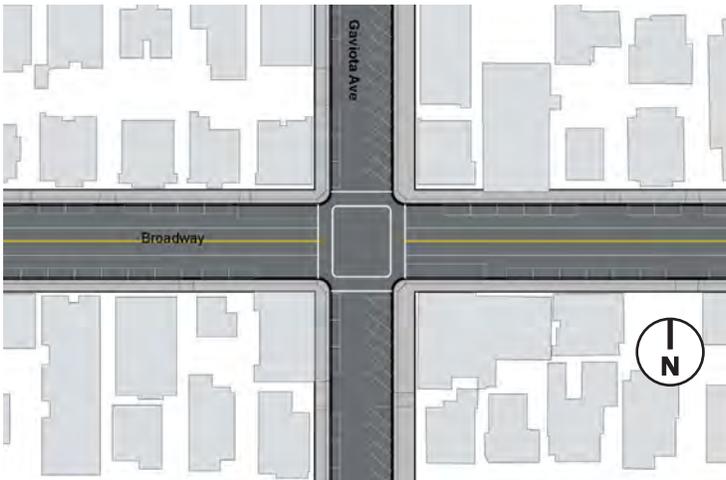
Broadway at Gaviota Intersection: Existing (91 parking spaces)
